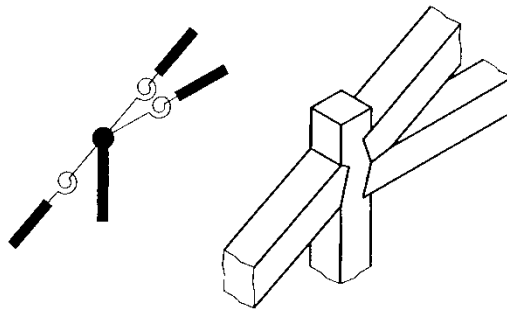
Spring element to model the truss joint (Parisi & Piazza 2002)
